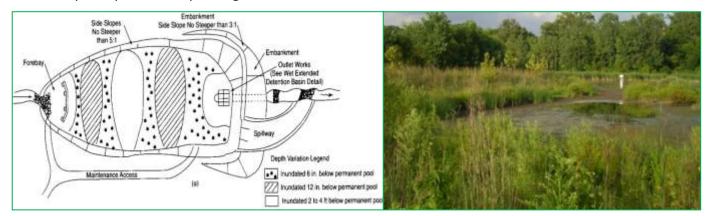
CONSTRUCTED WETLAND DESIGN PLAN VIEW (LEFT) AND TYPICAL CONSTRUCTED WETLAND INSTALLATION (RIGHT)
